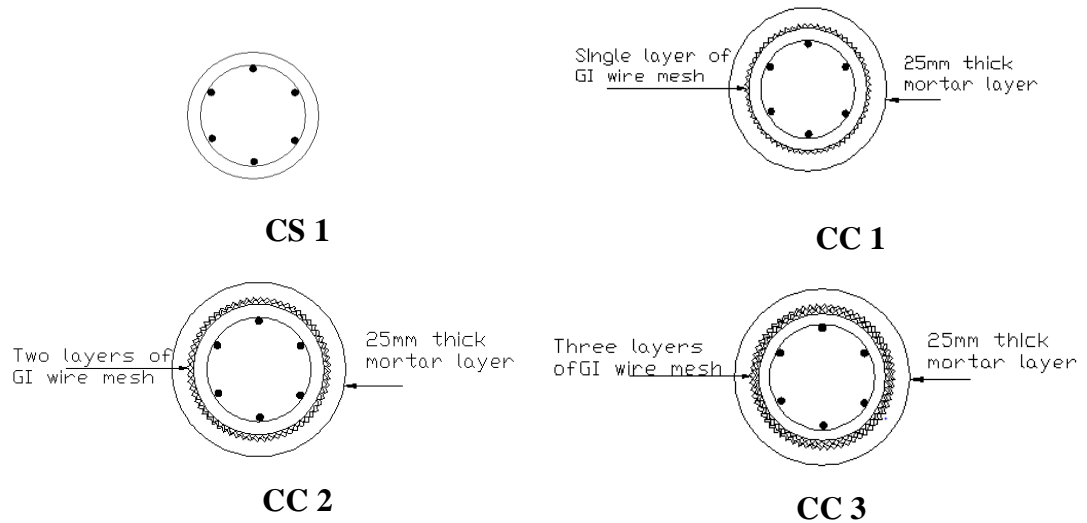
Cross-Section of Confined and Unconfined Cylindrical Columns
